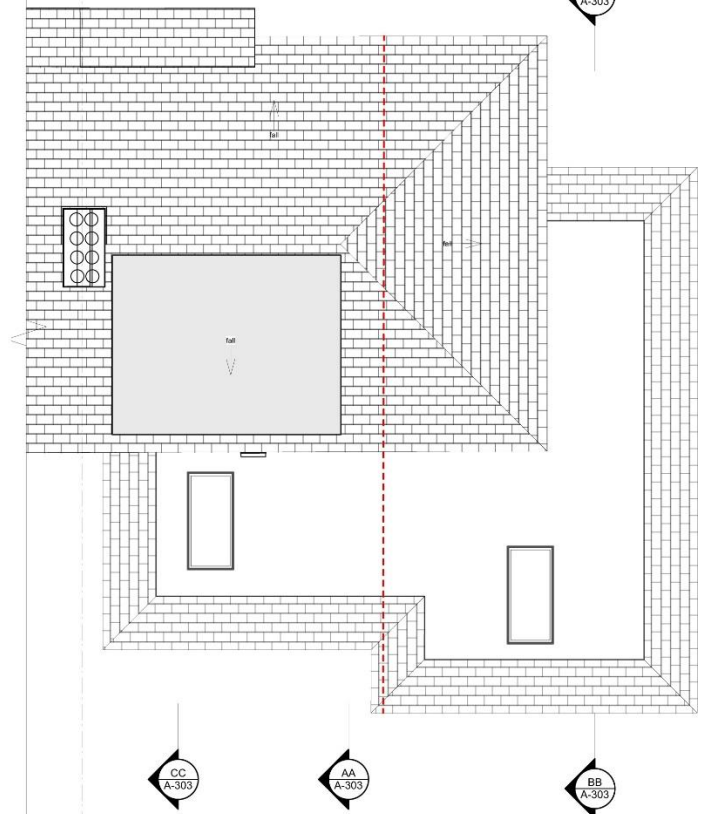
Existing & Proposed 2nd Floor & Loft Plans
